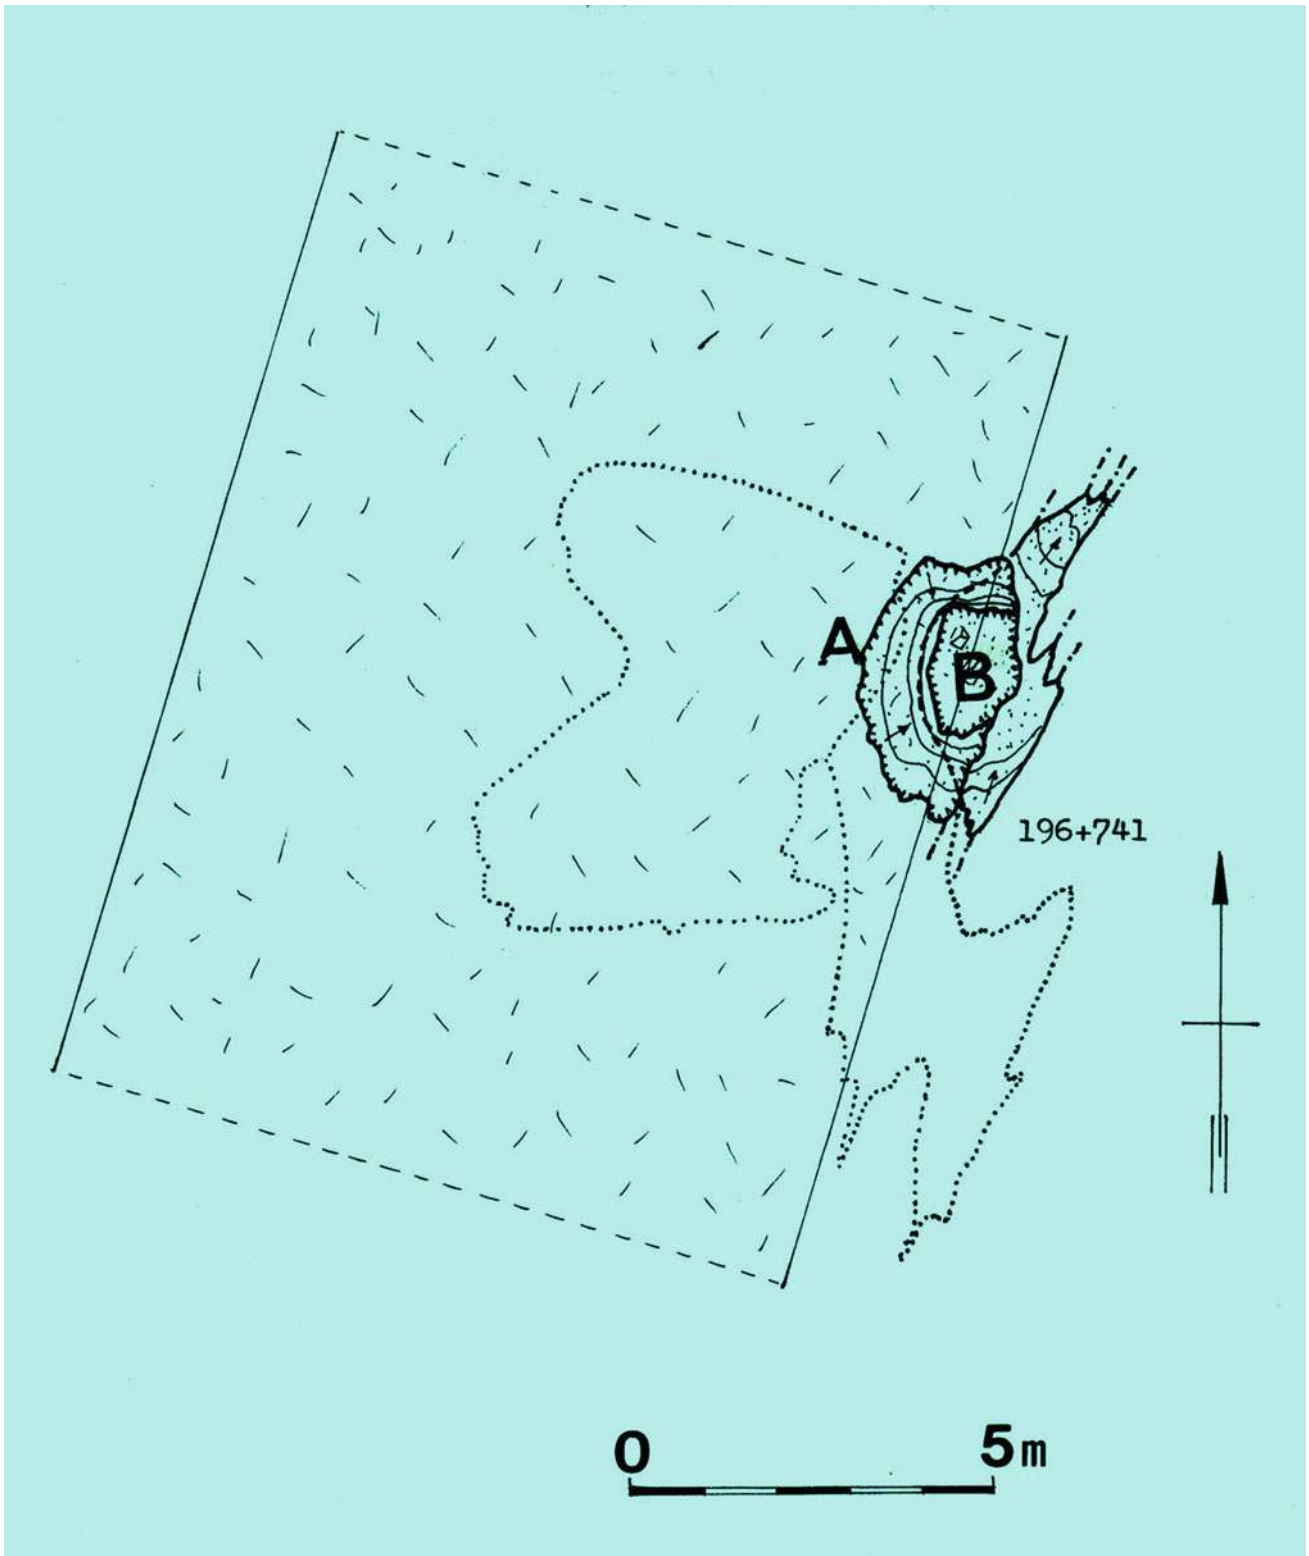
Plan of cavern at km 196 + 741 in Sveti Rok Tunnel
